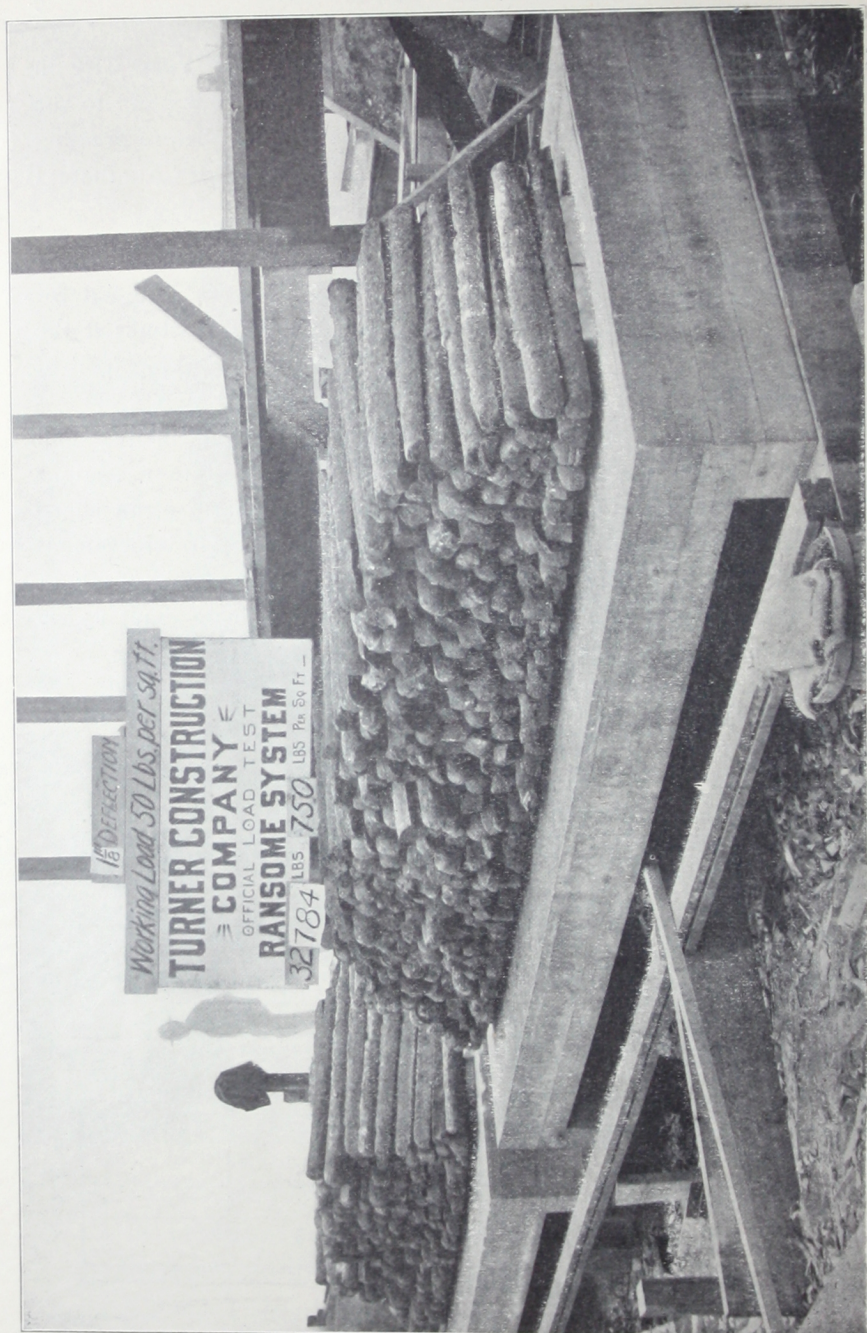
PLATE V. TRAP ROCK AND GRAVEL SECTIONS, 14' 6" SPAN, RAMSOME SYSTEM.
